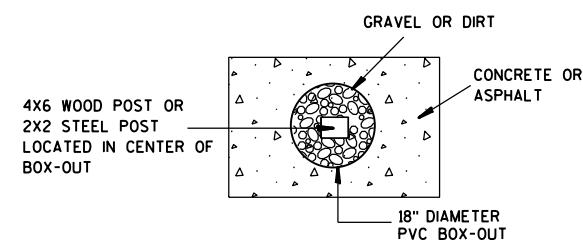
X 6 SIGN POST IN BOX-OUT
